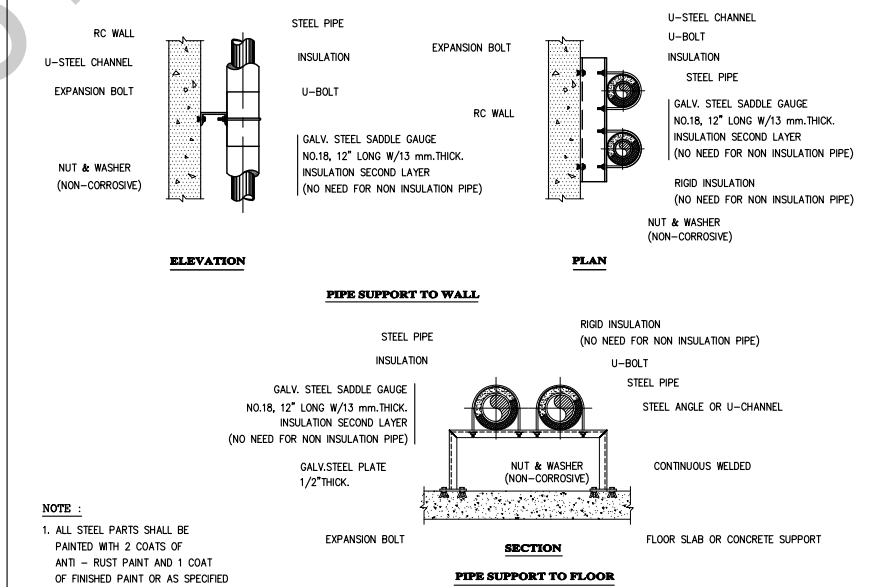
DETAIL : REFRUGERANT PIPING CONDUIT & SUPPORT SHEET HANGER FOR FCU SYSTEM
